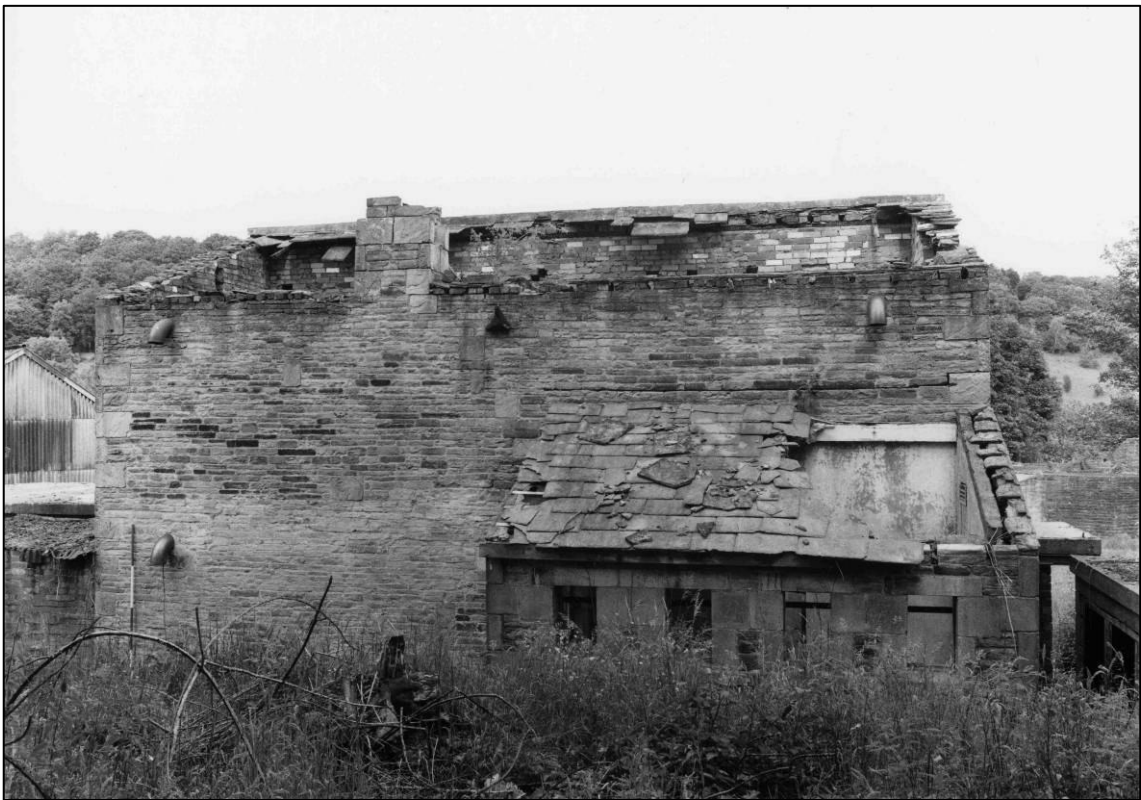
Mine offices (Buildings S1 and S5), looking N (photo 6/13).
